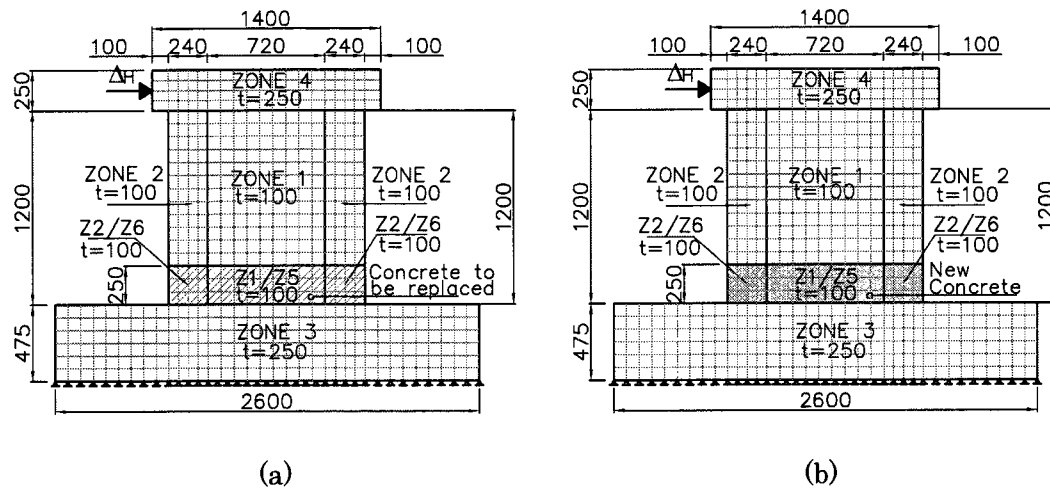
Finite Element Mesh of Walls: (a) LSW3; (b) RLSW3. All Dimensions in mm
